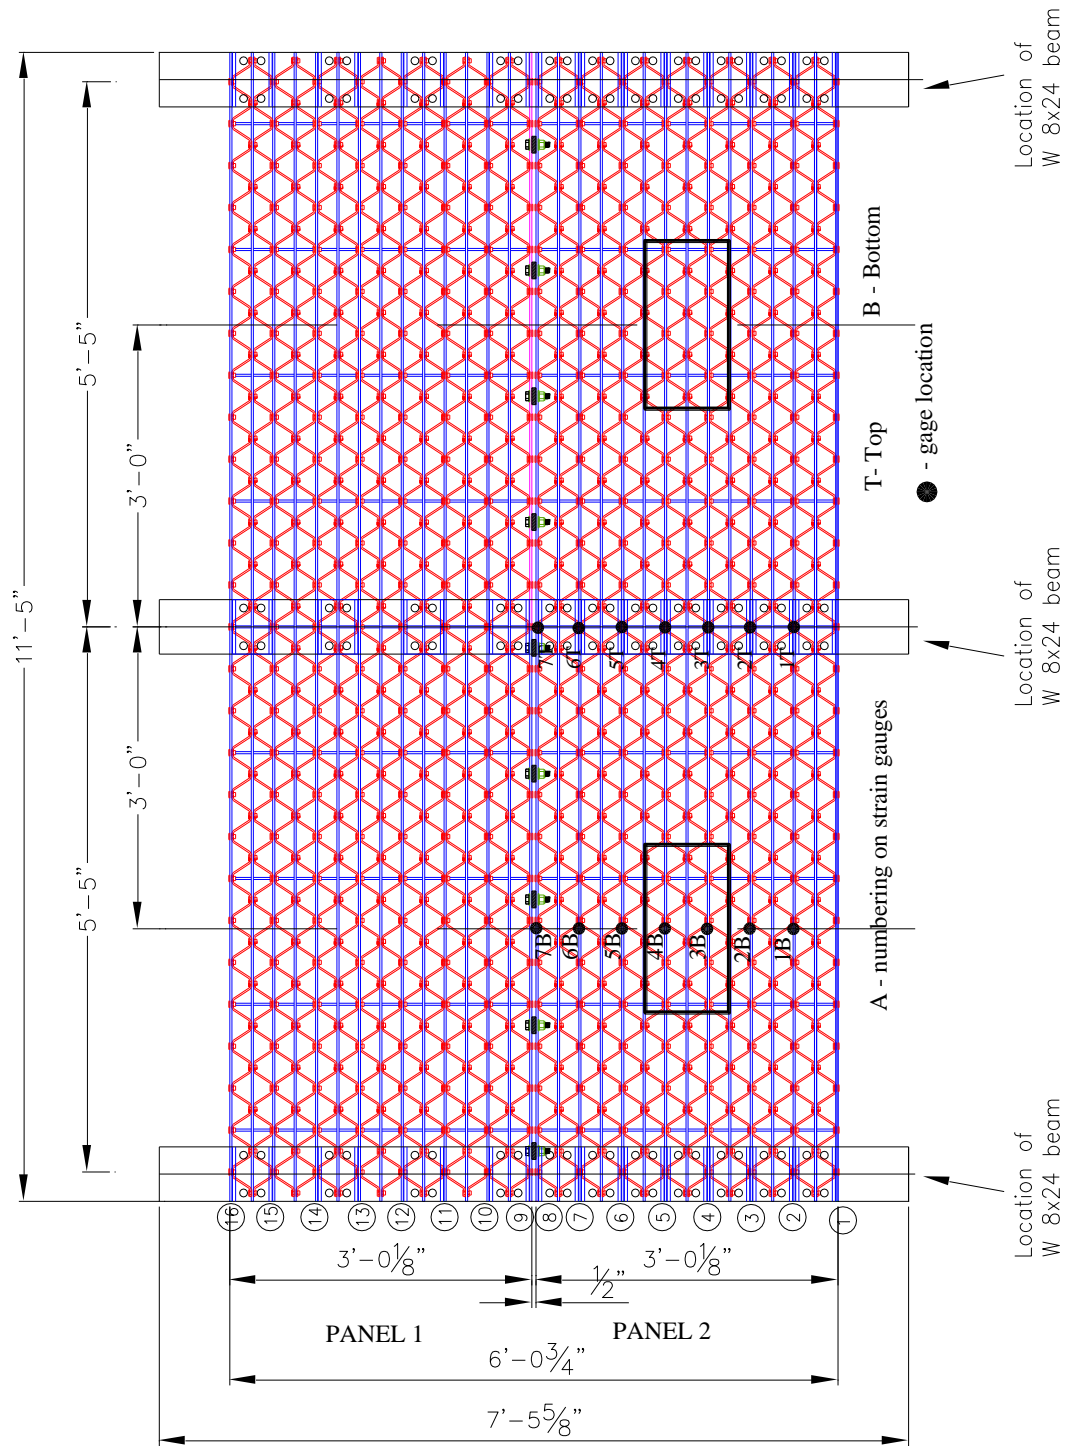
General Arrangement of 37R5-B1 with gage and load positions for test #5
